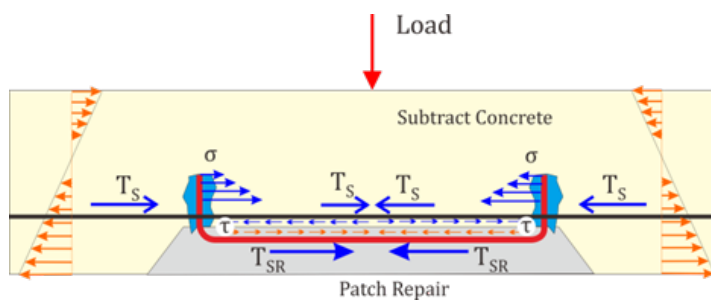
Proposed force and stress scheme of beam reinforced with Staple shape rebar
